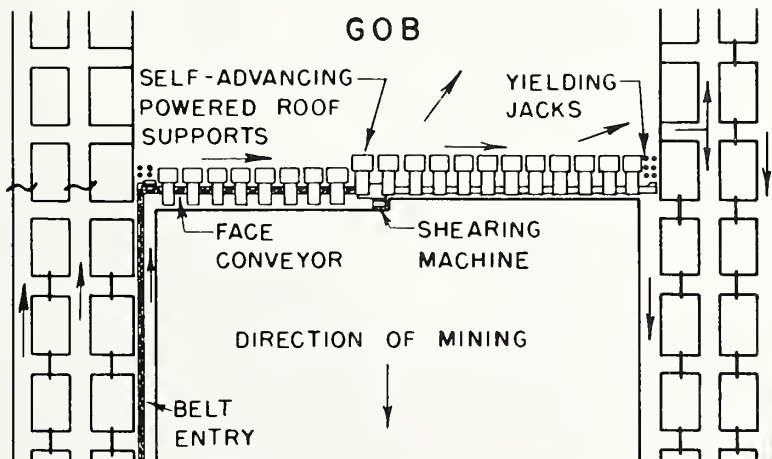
Plan of the longwall face shown in Fig. 12.
